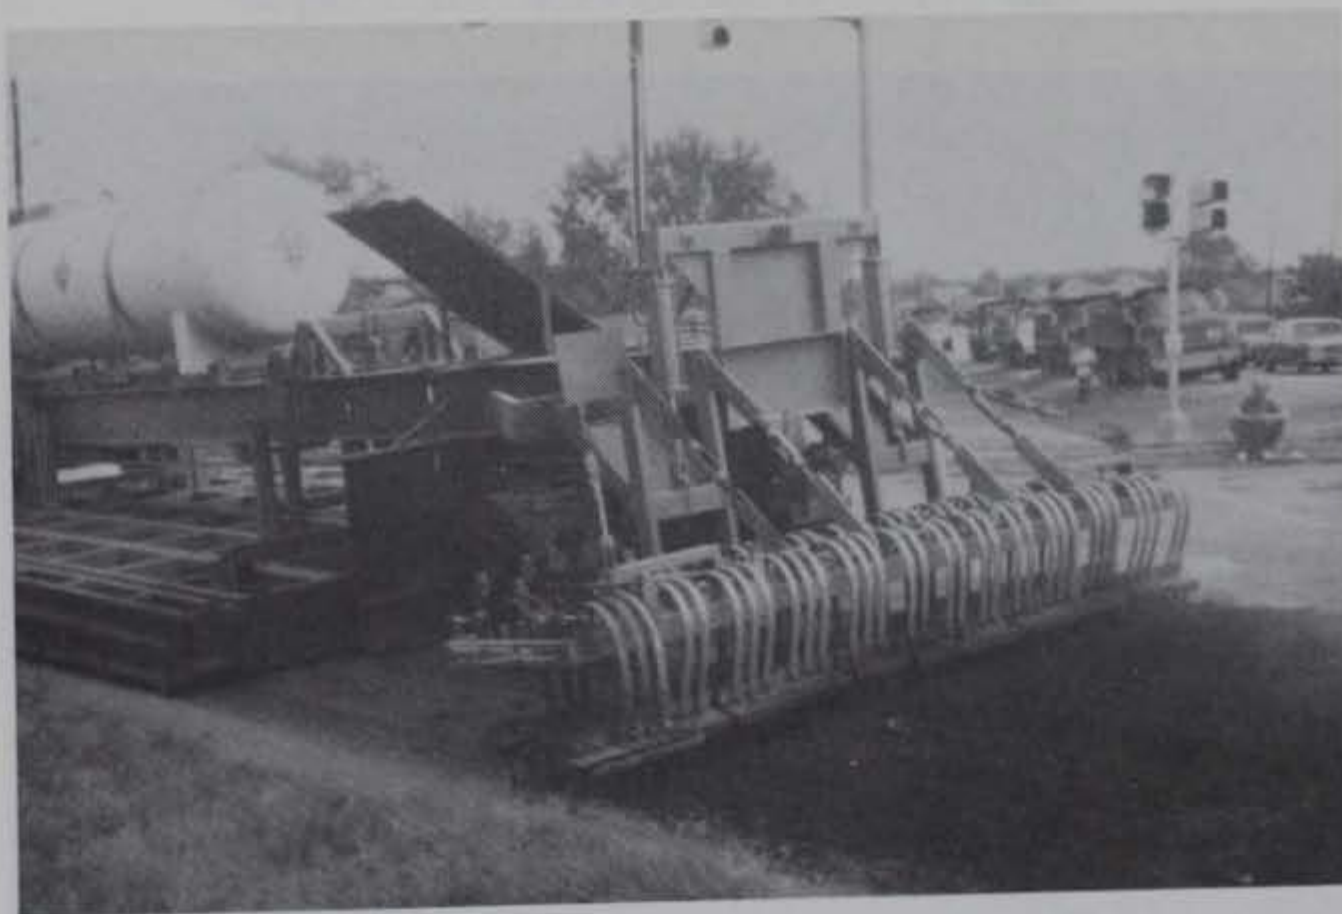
Heat deflection shield, directly behind heater and ahead of steel wheels; also not spring loaded scarifier
